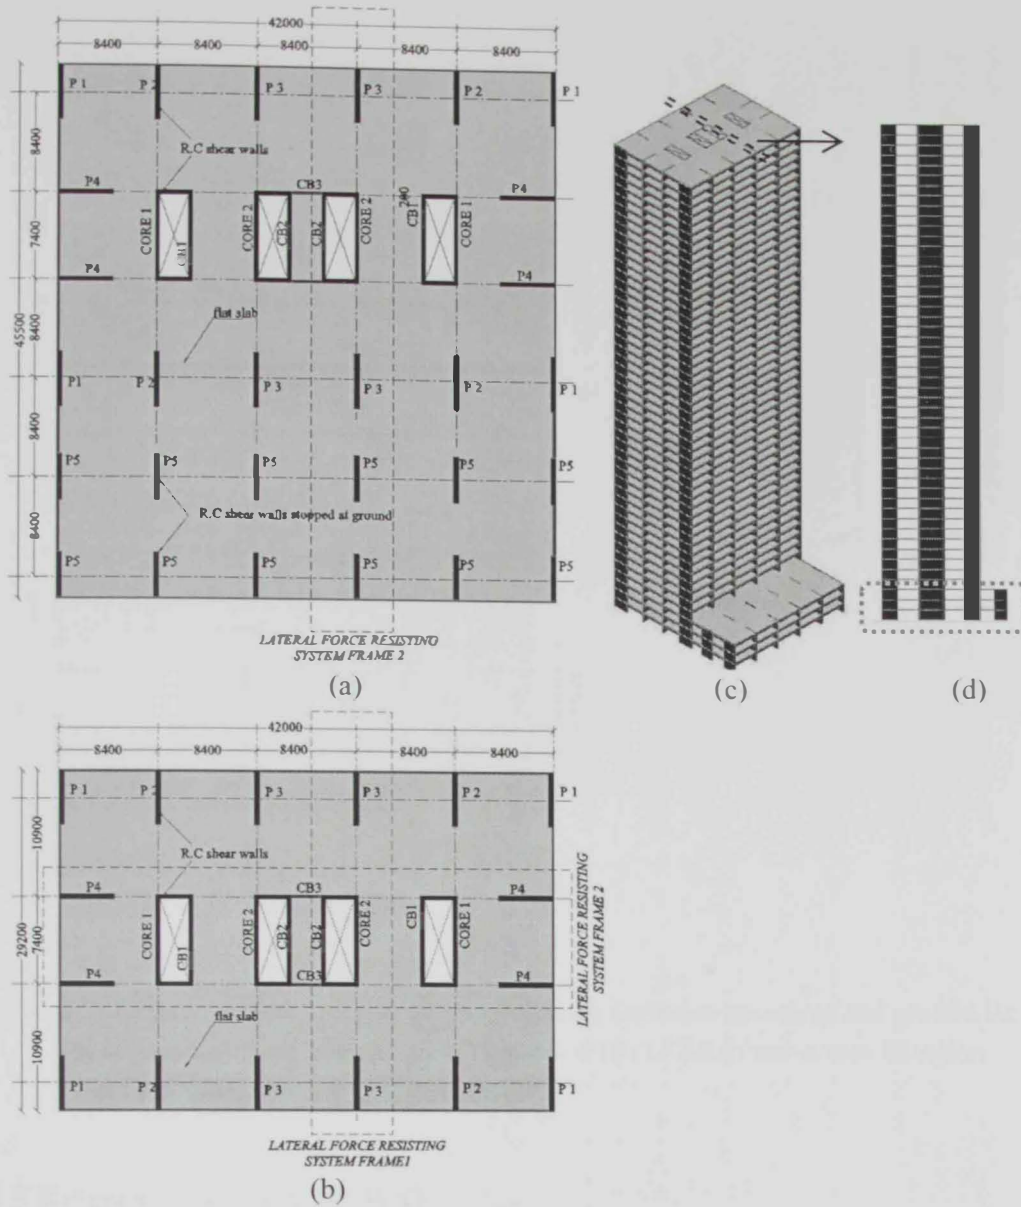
Reference structure B3-GEO, (a) building layout at basement stories, (b) layout at ground and typical stories, (c) 3D view and (d) LFRS in transversal direction
